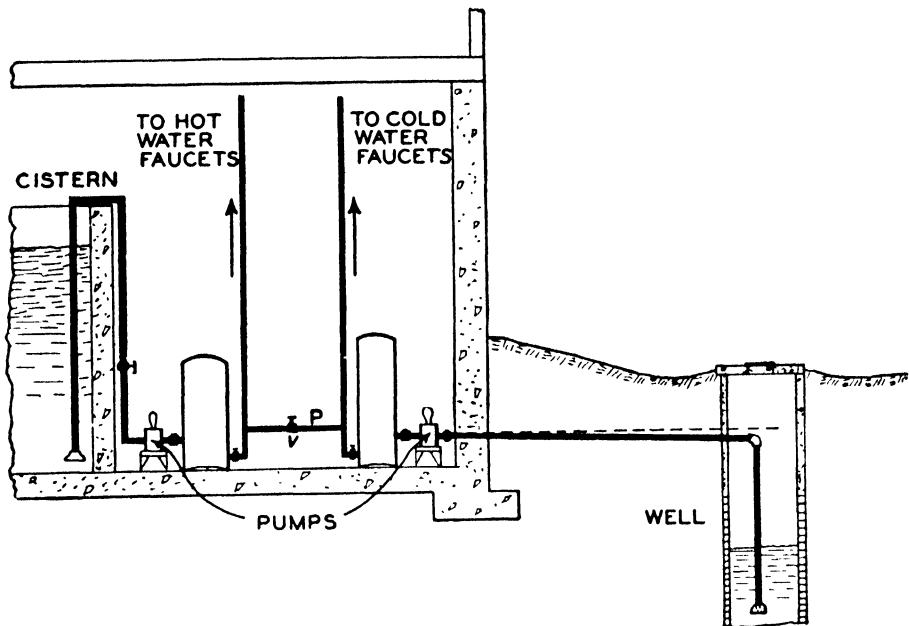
An arrangement for pumping well water to the cold-water faucets, toilets, watering troughs, etc., and cistern water to the hot-water faucet. This plan requires two pumps but is quite satisfactory. A deep-well pump could be used to pump the well water.
